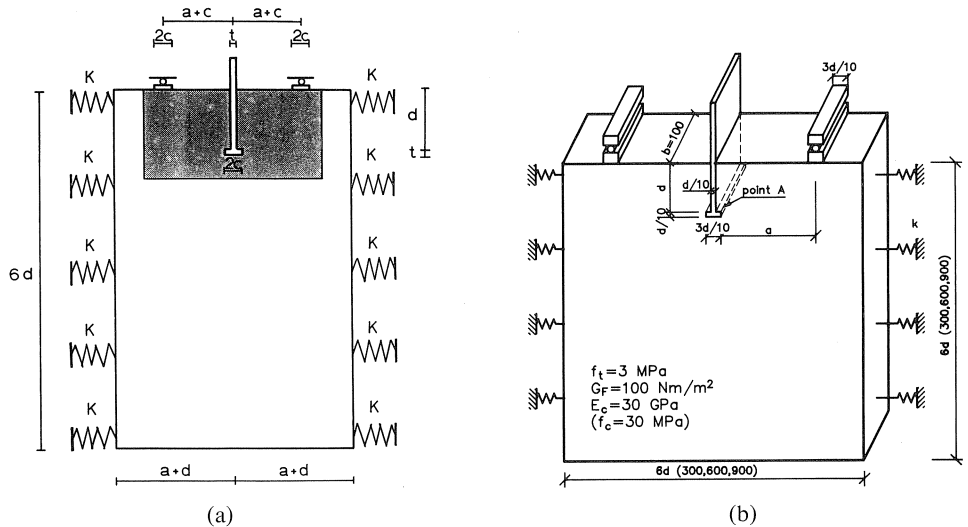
First (a) and second (b) geometry for pull-out of anchor bolts.
